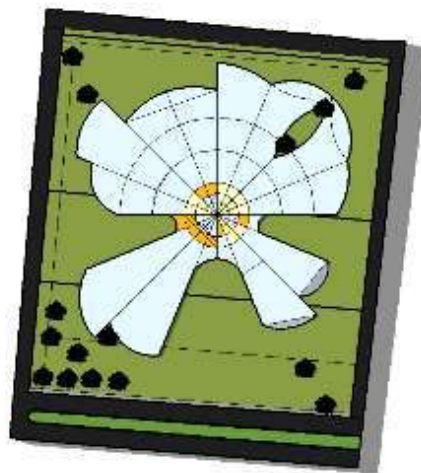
Building Mass Illustration based on Site Terrain Level and Tree Arrangement (Author's data, 2018)
